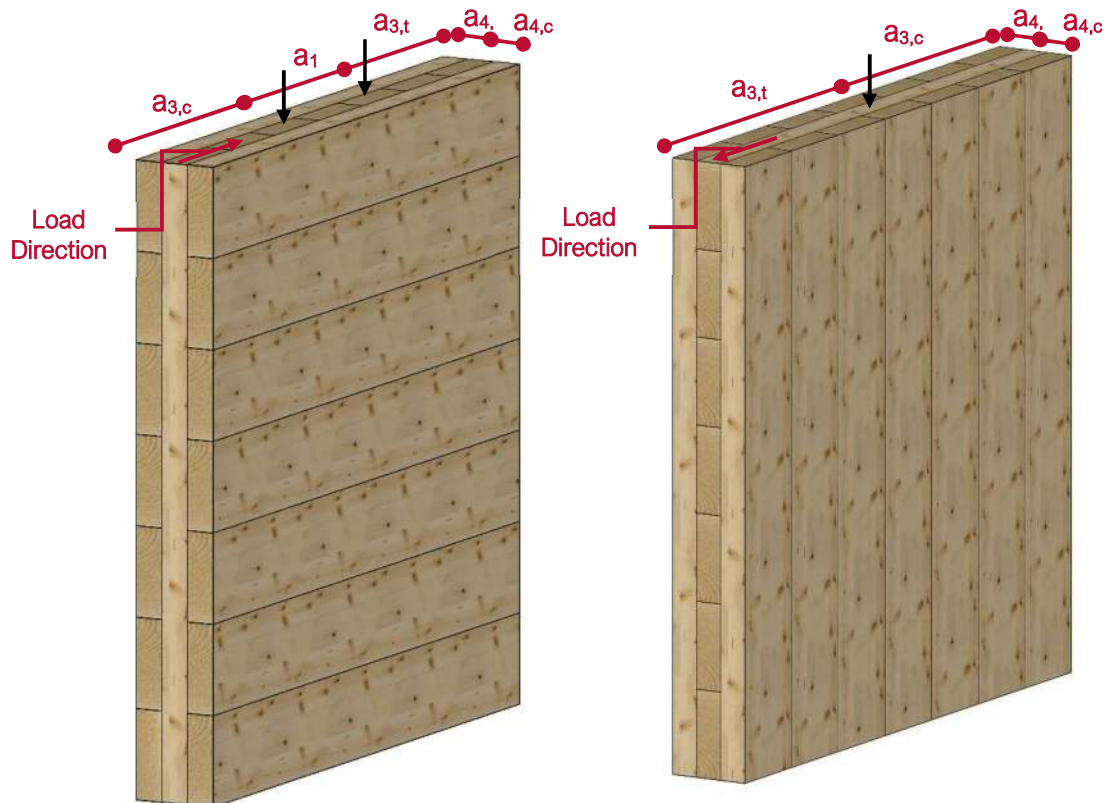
Spacing placement of fasteners on the edge of CLT panels.
